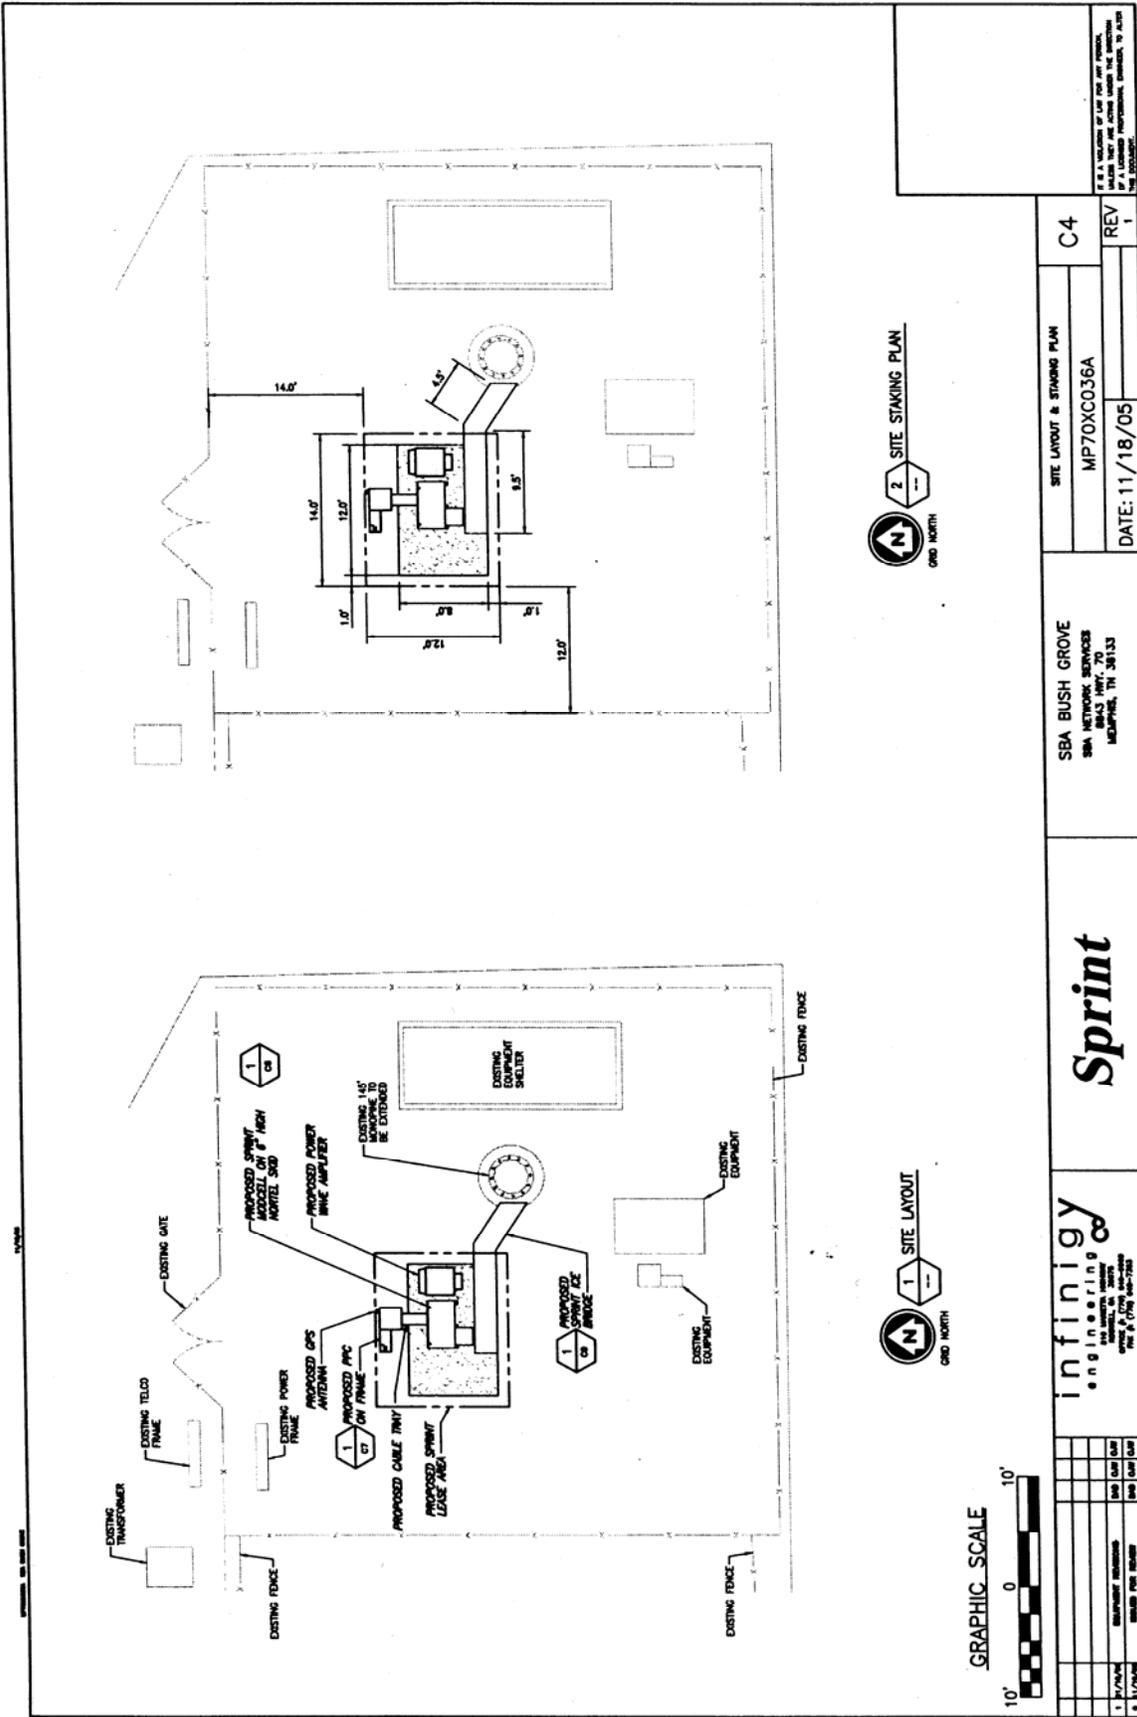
EXHIBIT E: LEASE PARCEL SITE LAYOUT --- INFINIGY DRAWING C-4
